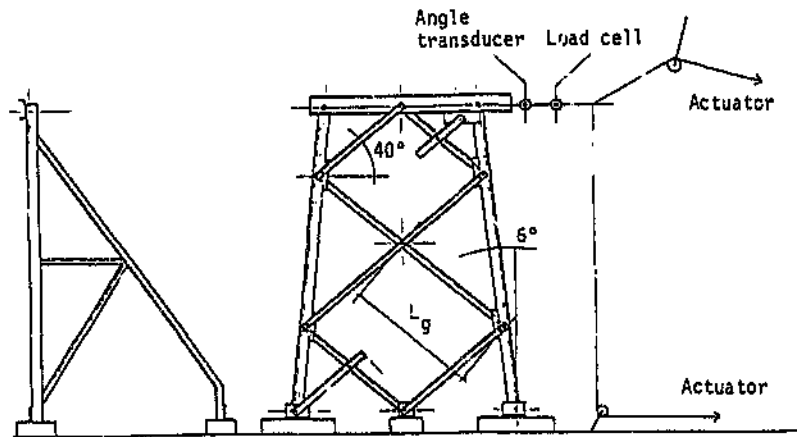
a: Typical experimental cross-bracing model, as reported by Wood [49] and CIGRE [63]. Note that the outside bracings and the main chords were connected to transversal beams. The compression members in the outside panels of bracing were reinforced against buckling at midspan by redundant bracings.
